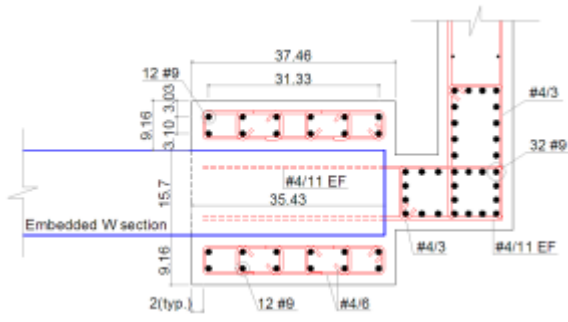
Section 4 reinforcement detail of CCW (stories 8-10)
